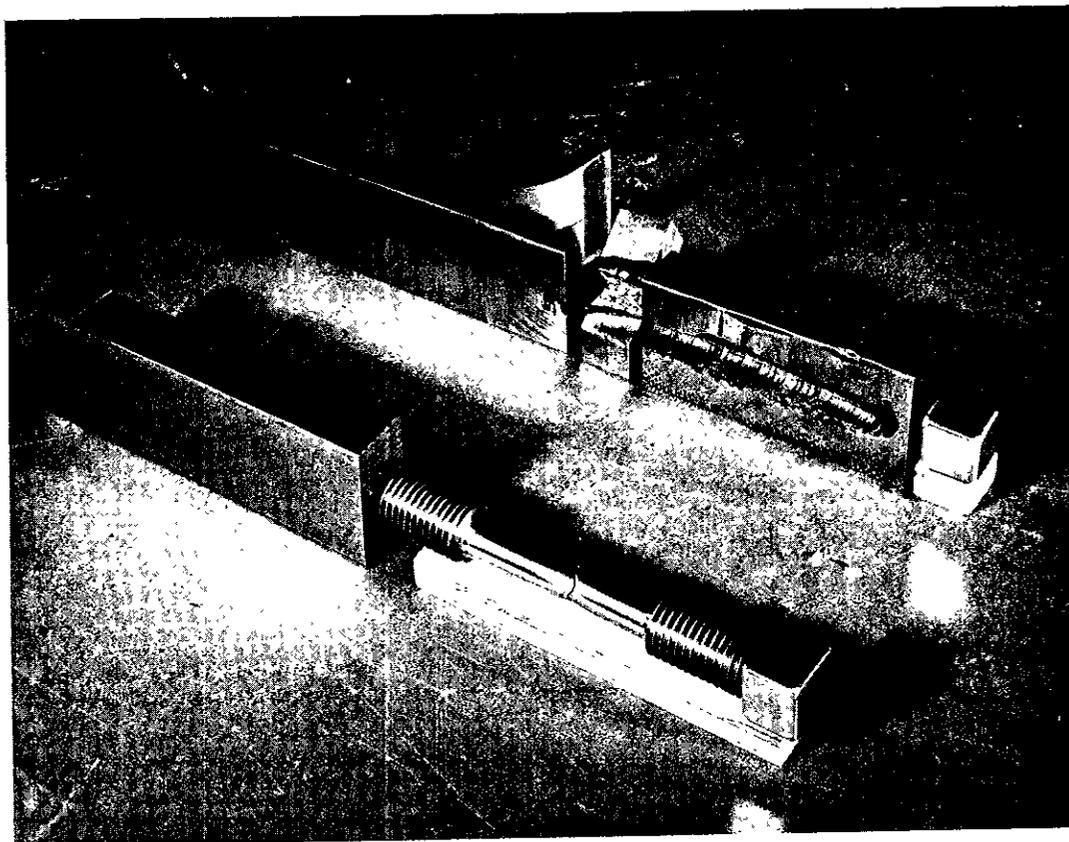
Bottom flange sample in foreground - Top flange sample in background - showing how pieces were removed from samples for examination and test.
